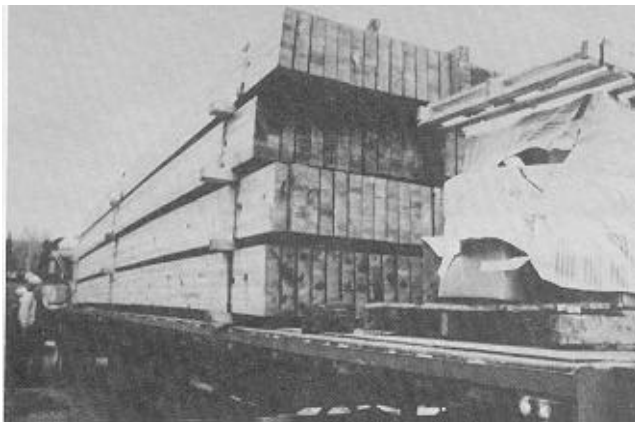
Arrival of beam laminations at bridge site; 15 to 16 beam laminations were banded into panels to facilitate transportation and construction. (M92 0009-3)
